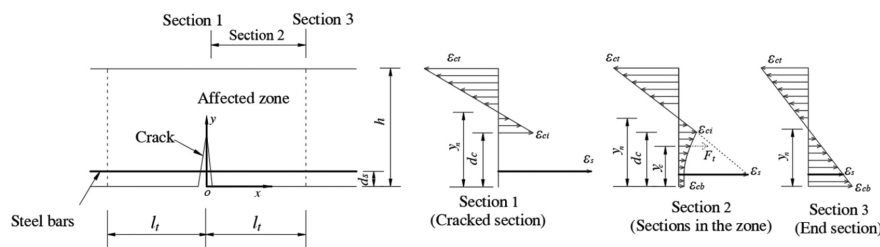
Strain distribution of cracked reinforced concrete beam structure (Fu et al., 2022)
